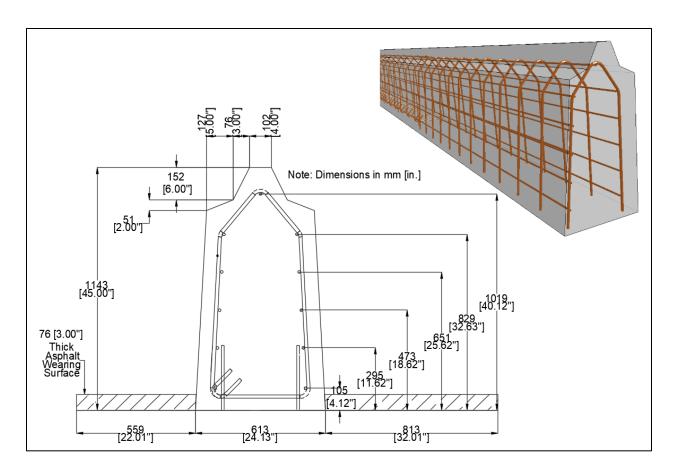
Cross-section and layout of Vertical Faced Concrete Median Barrier FE model
